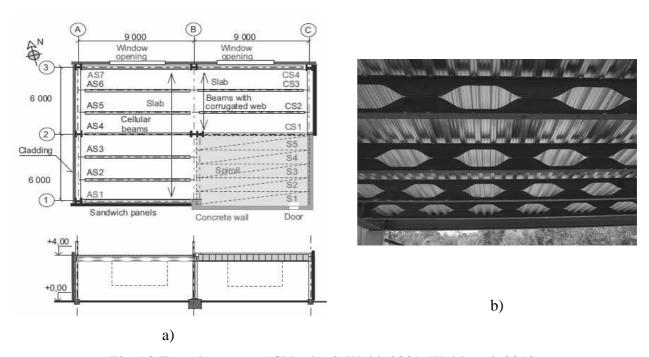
Tested structure (Chlouba & Wald, 2009; Wald et al, 2010)
